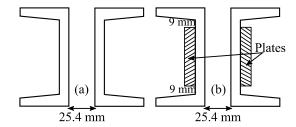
Cross-section of members (a) within the SS, verticals, diagonals, chord (b) chord outside SS
